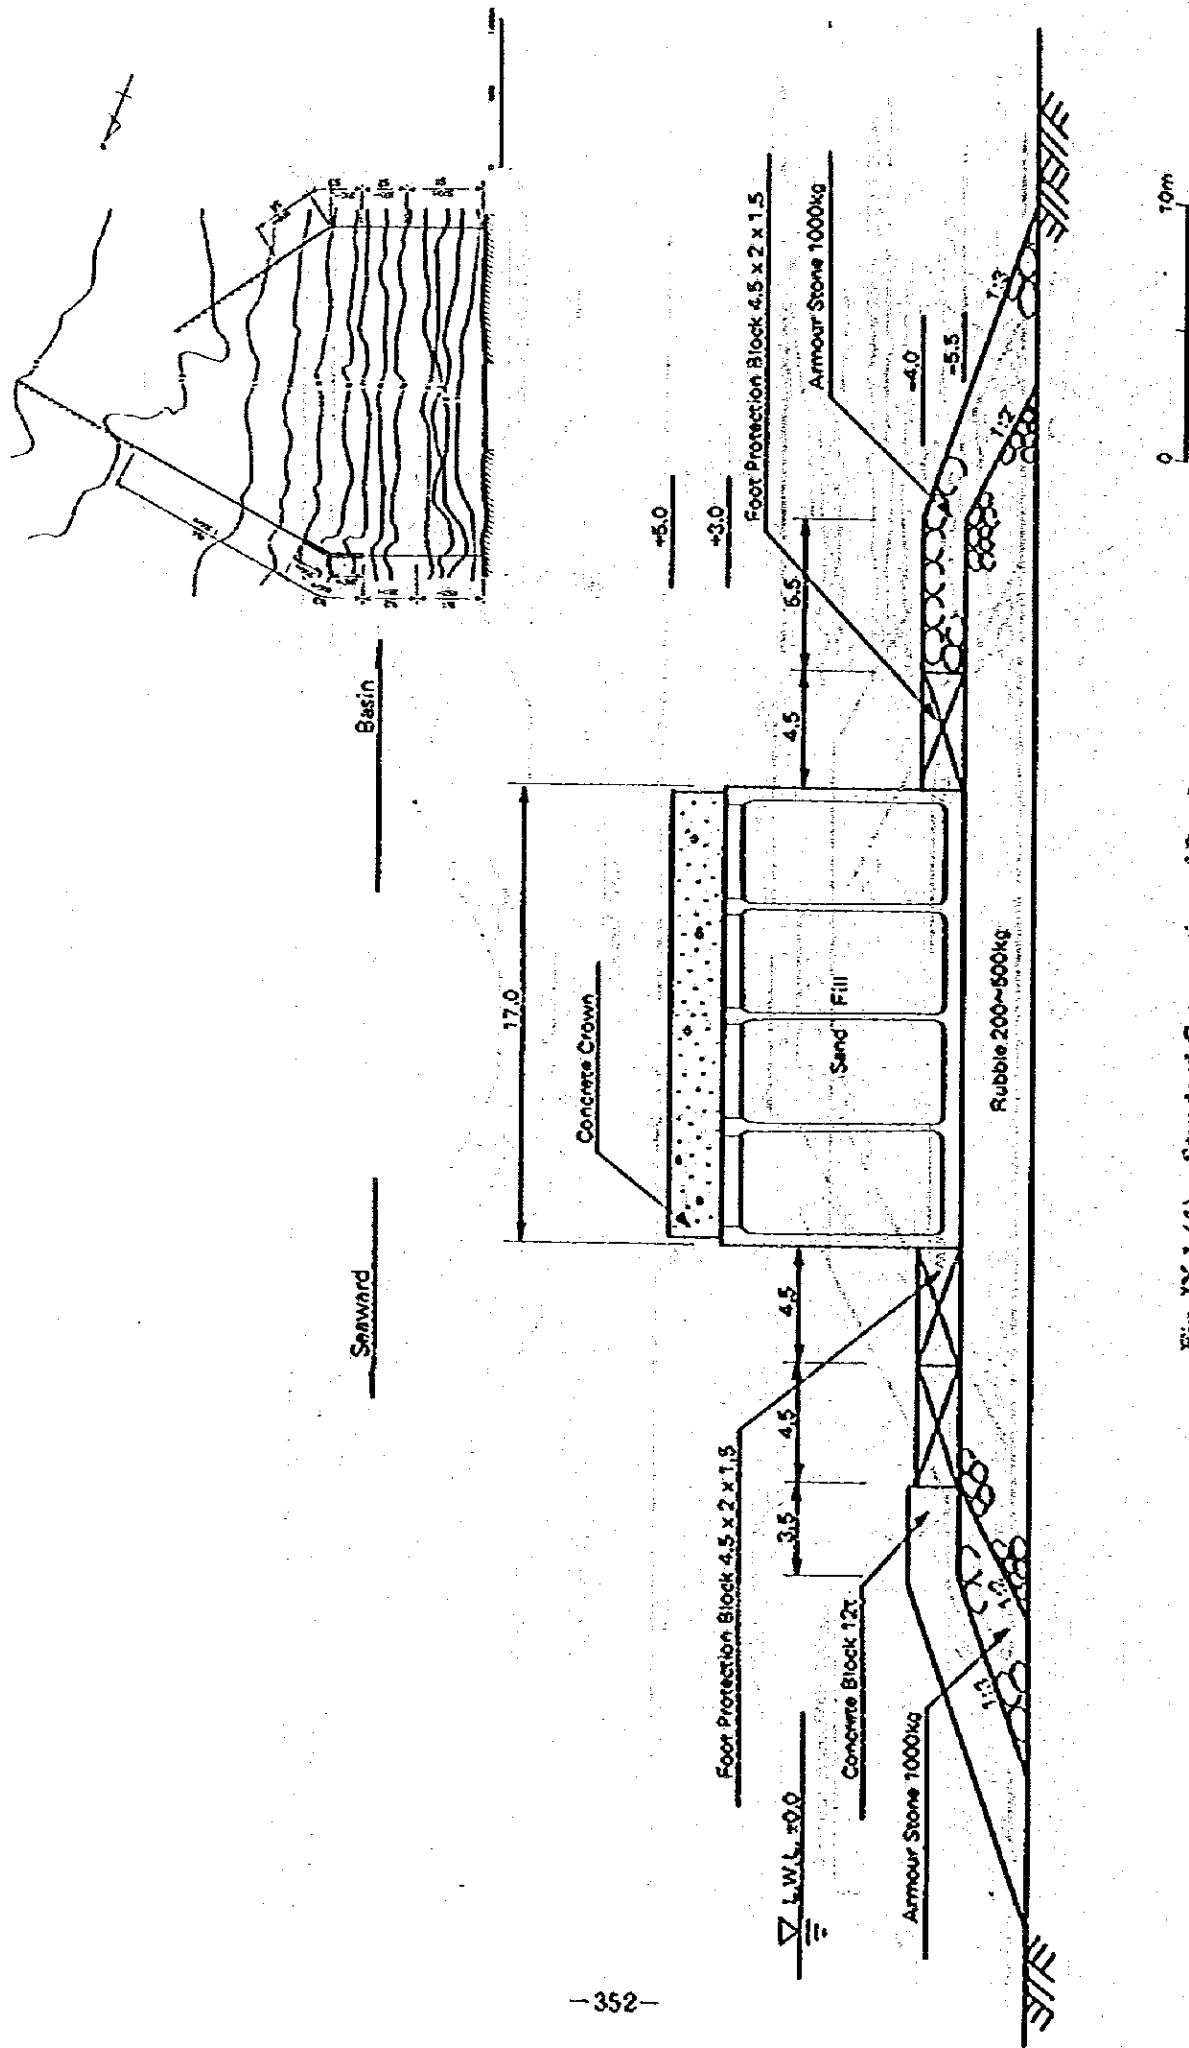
(4) Standard Connection of Breakwater (N3 Section)
